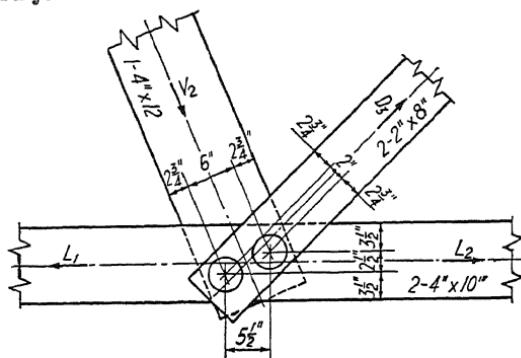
Lower chord joint for 80-ft. Fink truss.
